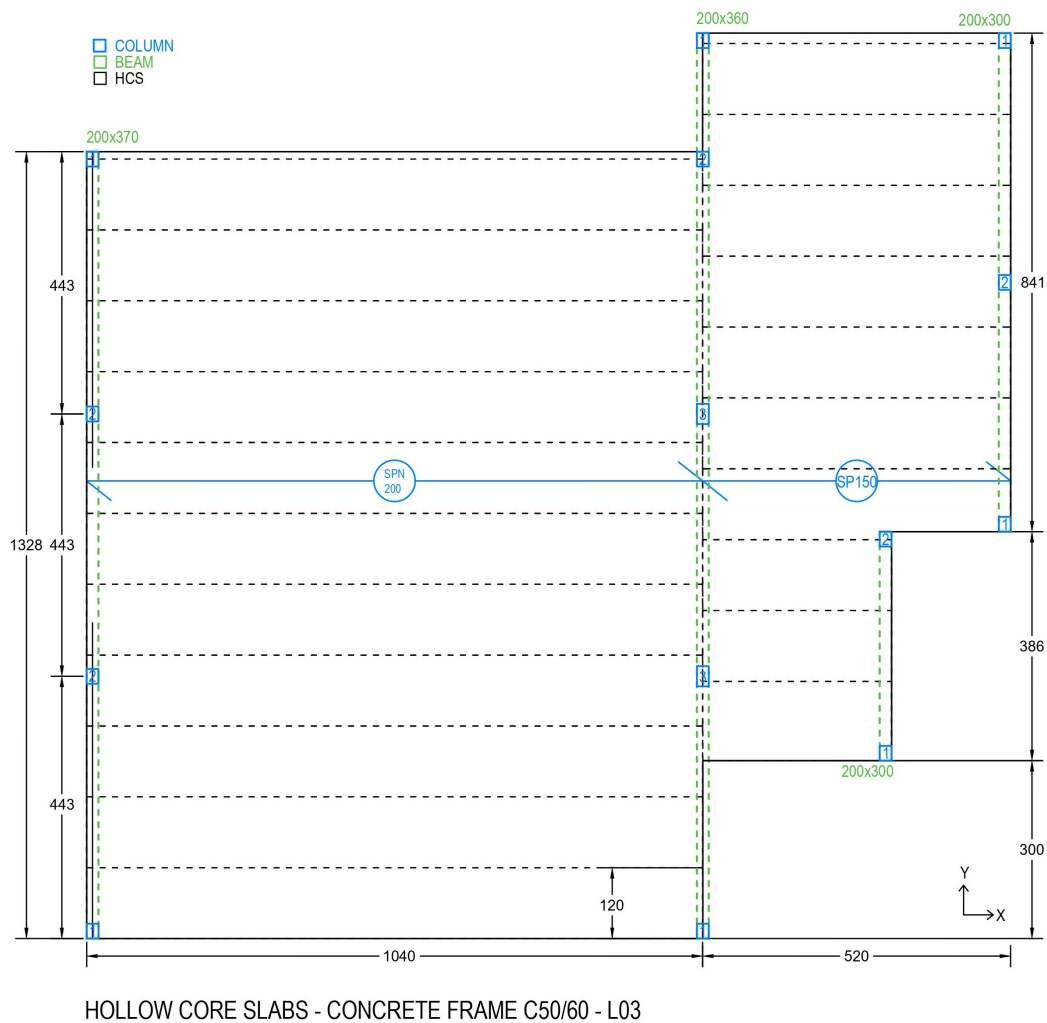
Conceptual structural design plan of the FU with HCS supported by a frame structure - L03
